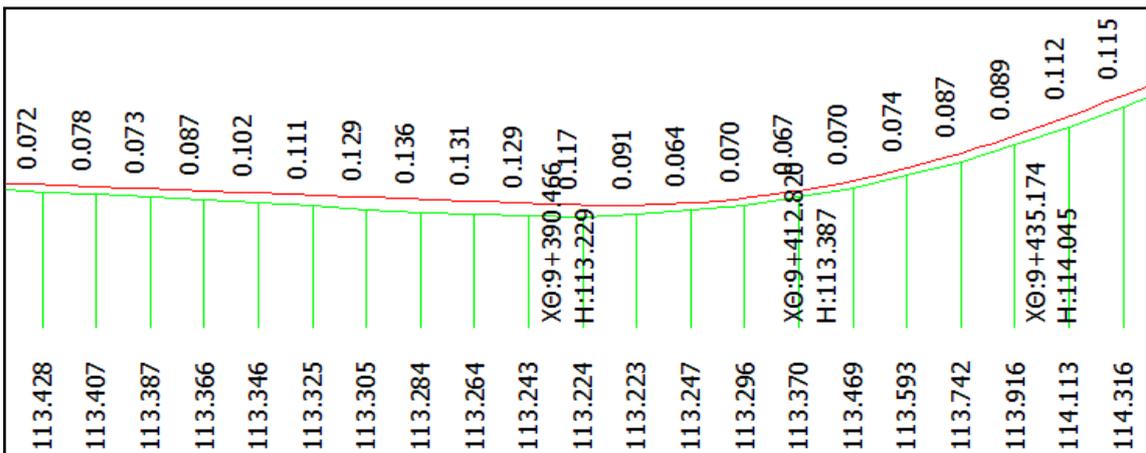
Detail of the reconstructed road long section, DPSM by velocity 20-25 km/h, passing B
